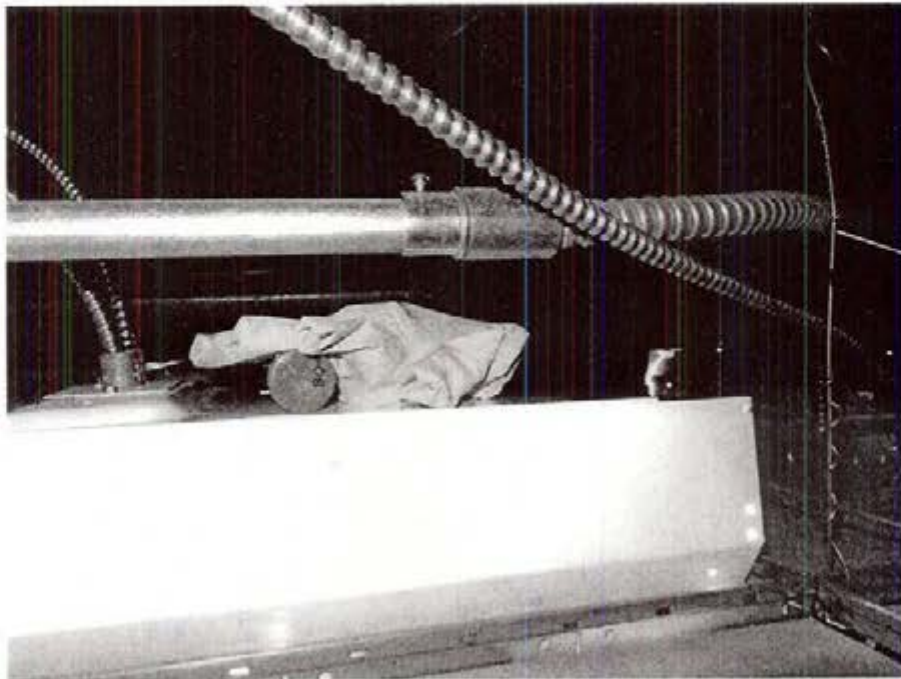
Lead wipe sample (042414-IFR-W-08) collected from the top of a fluorescent light fixture; above the drop ceiling of the office entryway.
